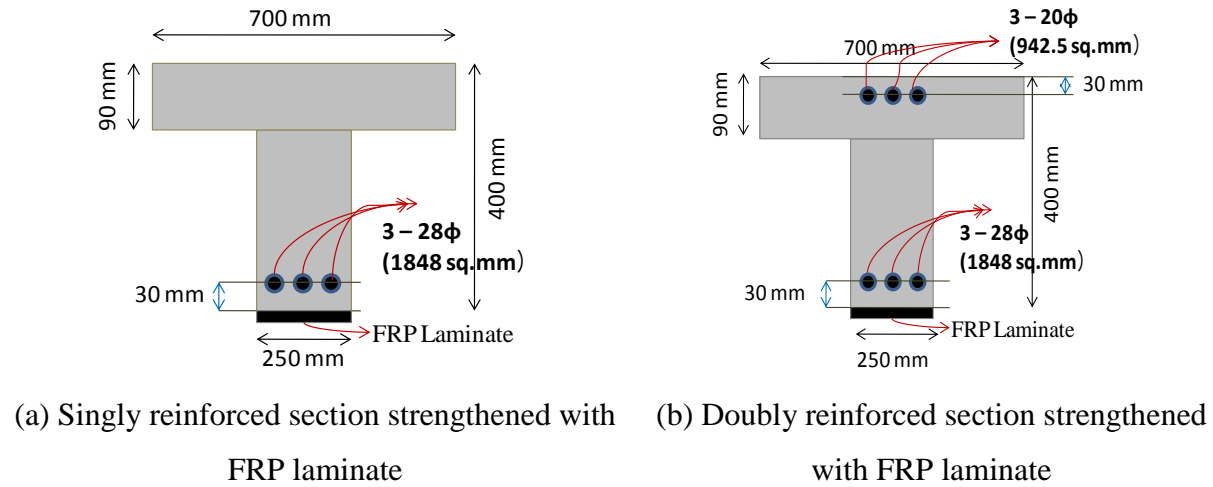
Detailing of T shaped RCC cross sections strengthened with FRP laminates
